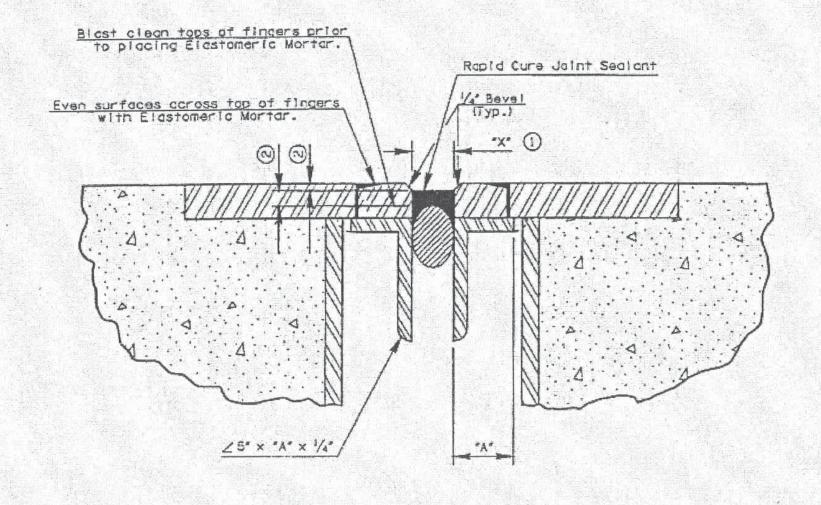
DETAIL OF EXPANSION JOINT WITH SLIDING PLATE REMOVED
